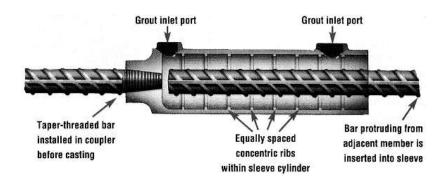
Lenton *Interlok* Grouted Sleeve Coupler [2.3]
